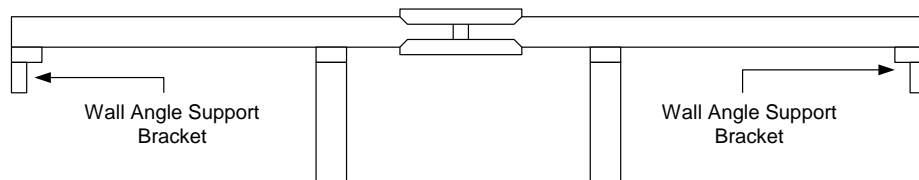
Side View of a Cable Tray with Wall Angle Support Brackets
